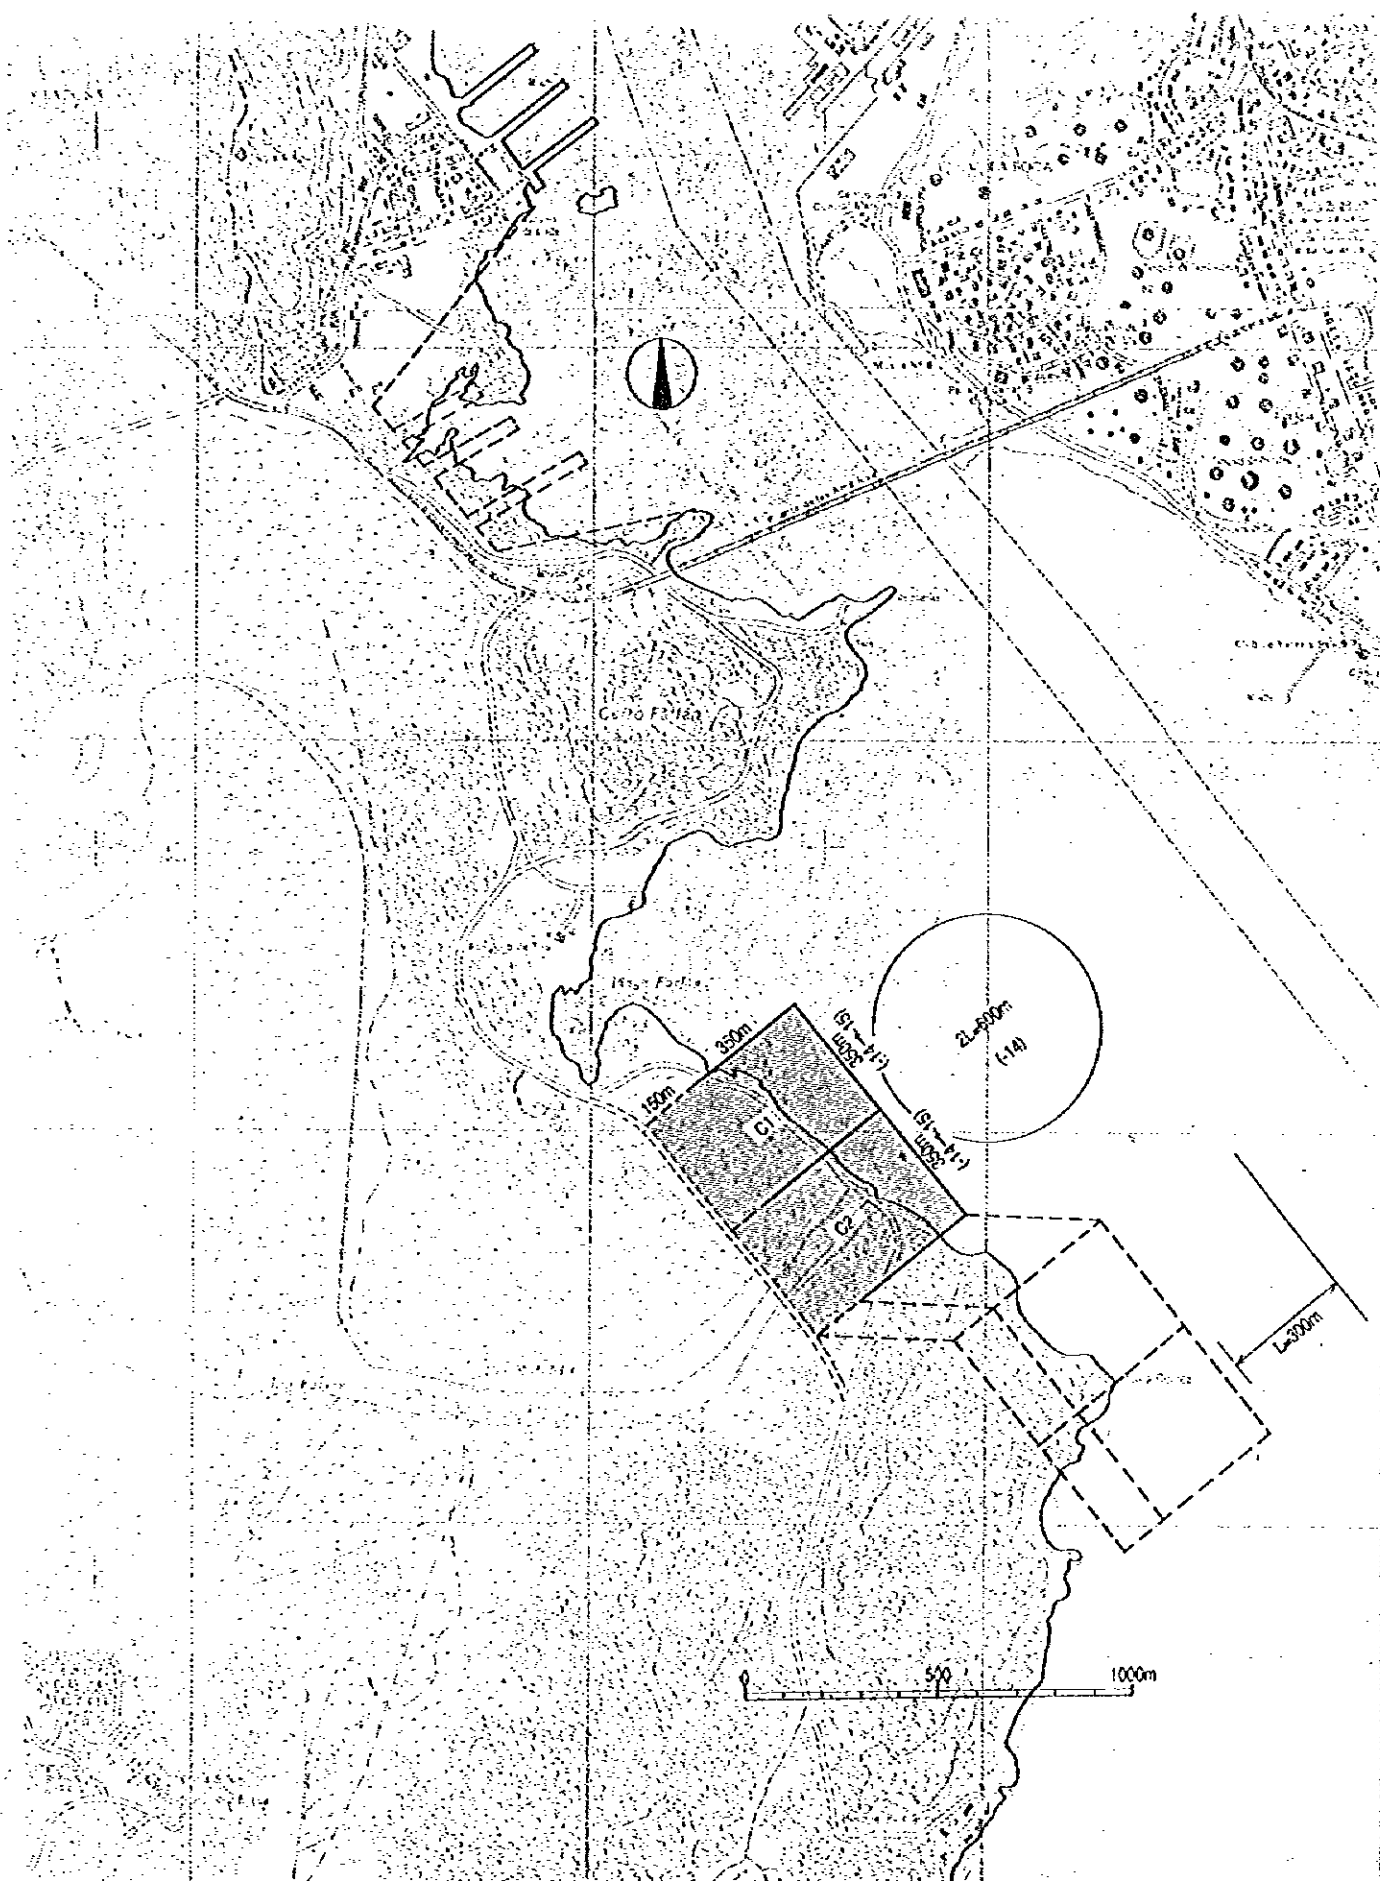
Surrounding Area of New Container Terminal at Farfan
